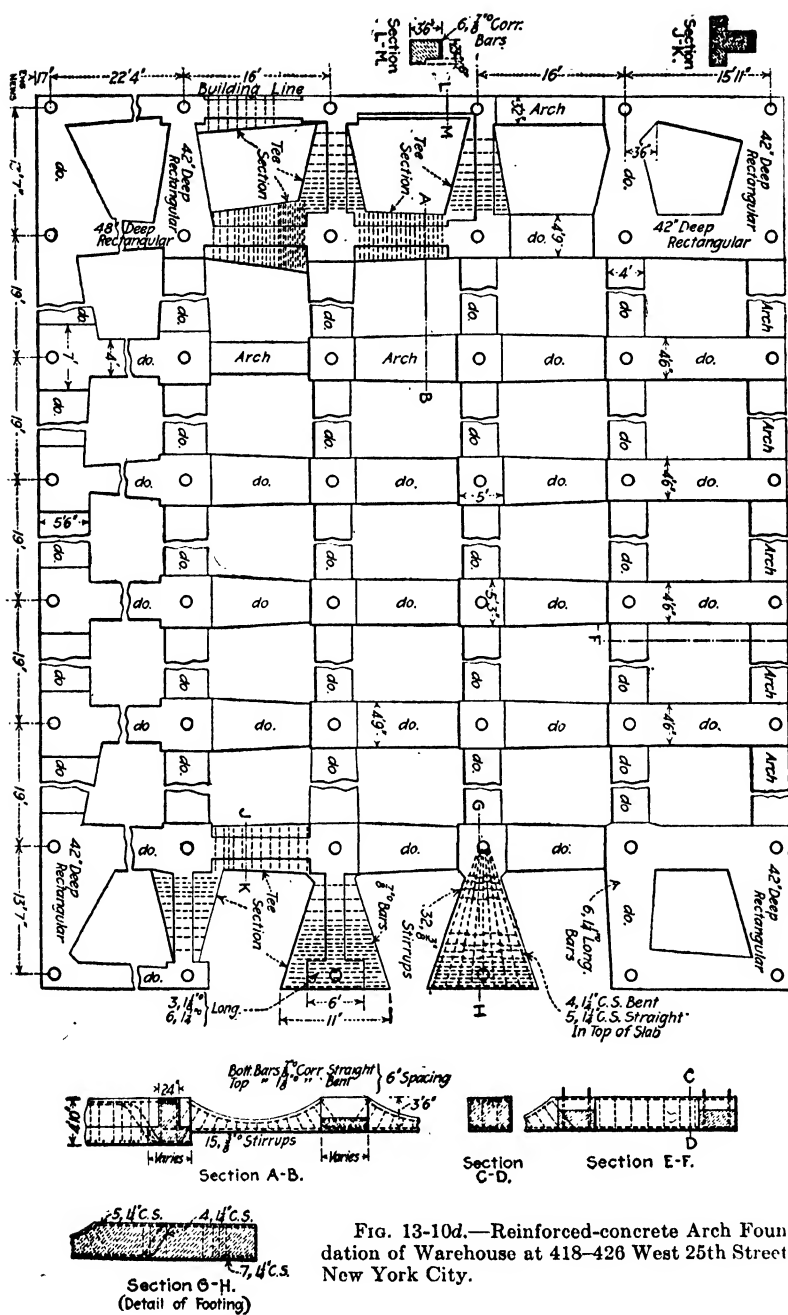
Reinforced-concrete Arch Foundation of Warehouse at 418-426 West 25th Street, New York City.
